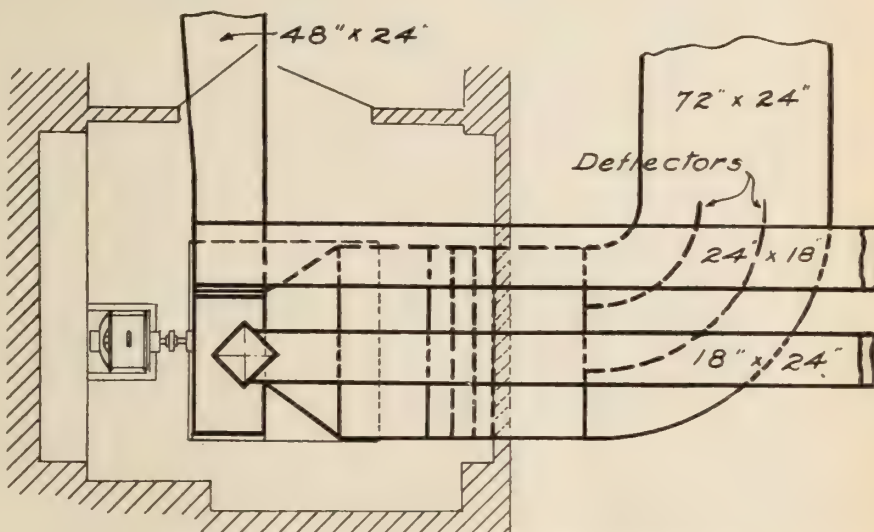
PLAN VIEW OF BASEMENT FAN ROOM NO. 8.
